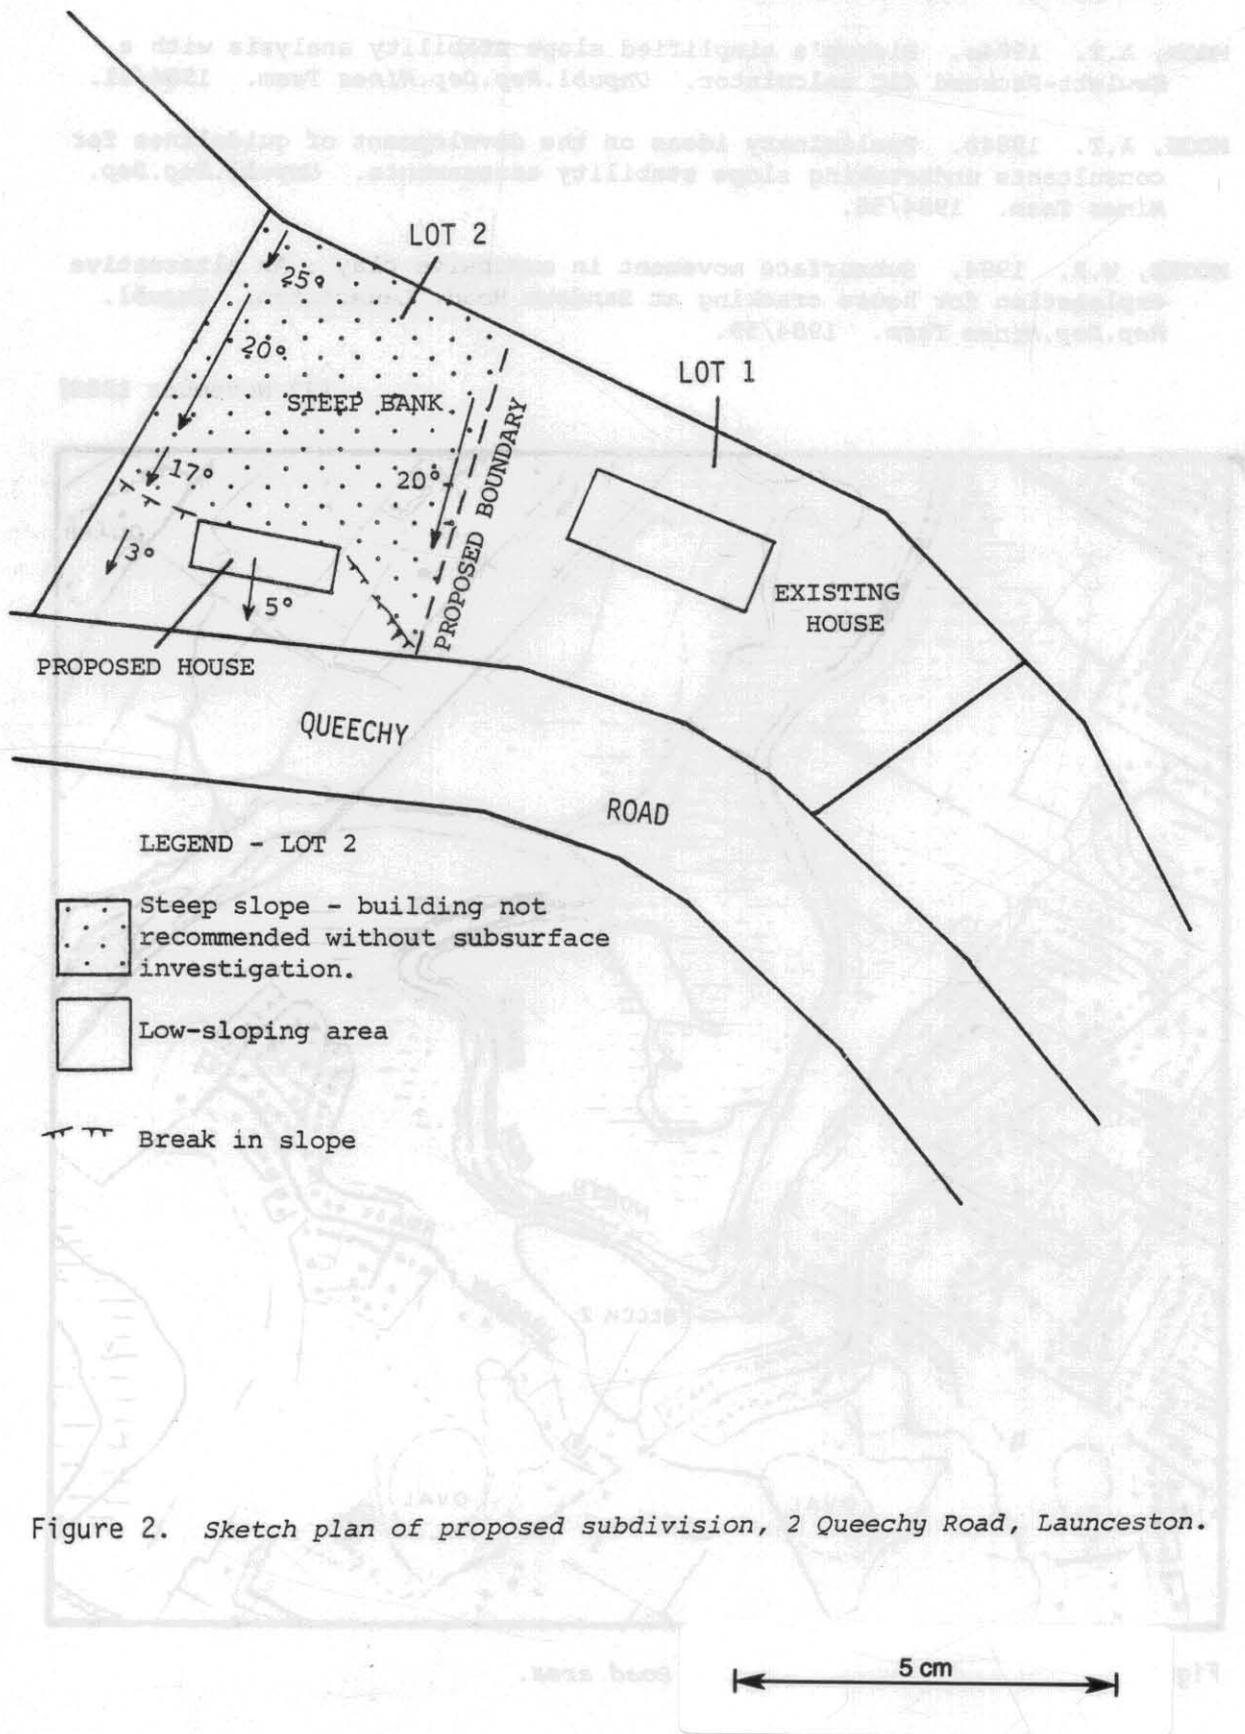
Sketch plan of proposed subdivision, 2 Queechy Road, Launceston.
